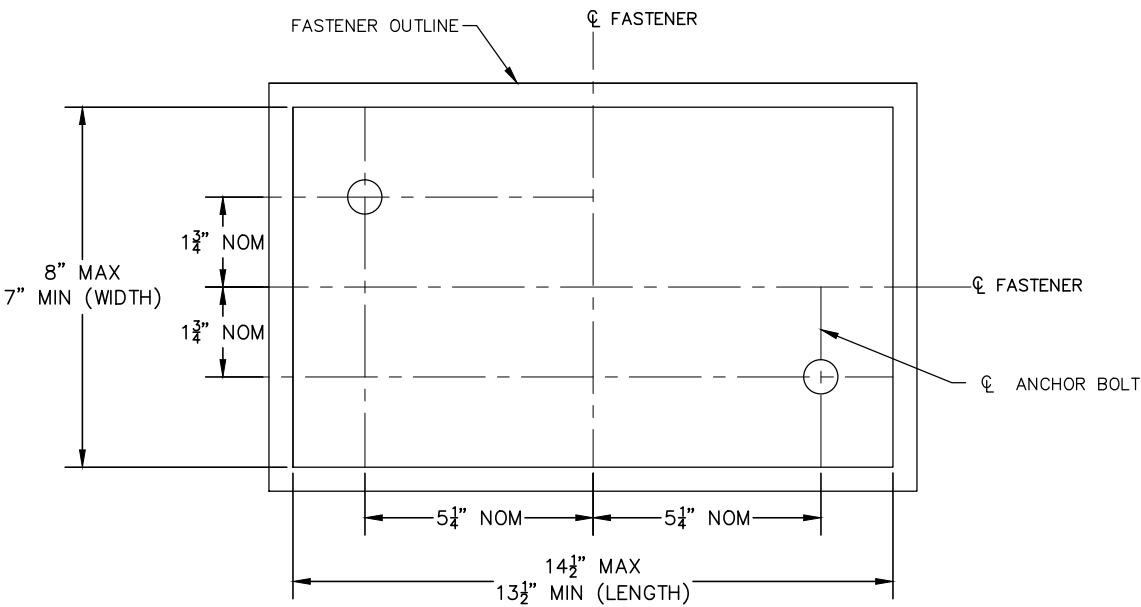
DETAIL A – STANDARD DF FASTENER ON PLINTH
